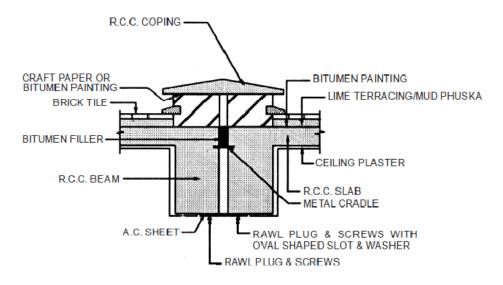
Details of Raised Type Expansion Joint at Roof
